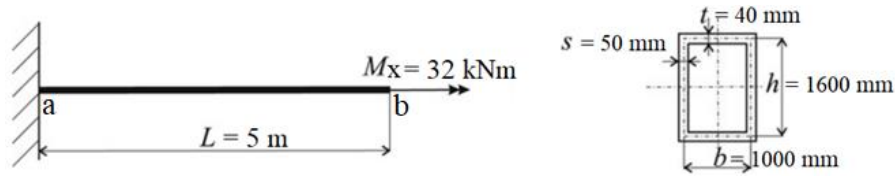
Cantilever beam of a closed cross-section example [23] (Modified)
